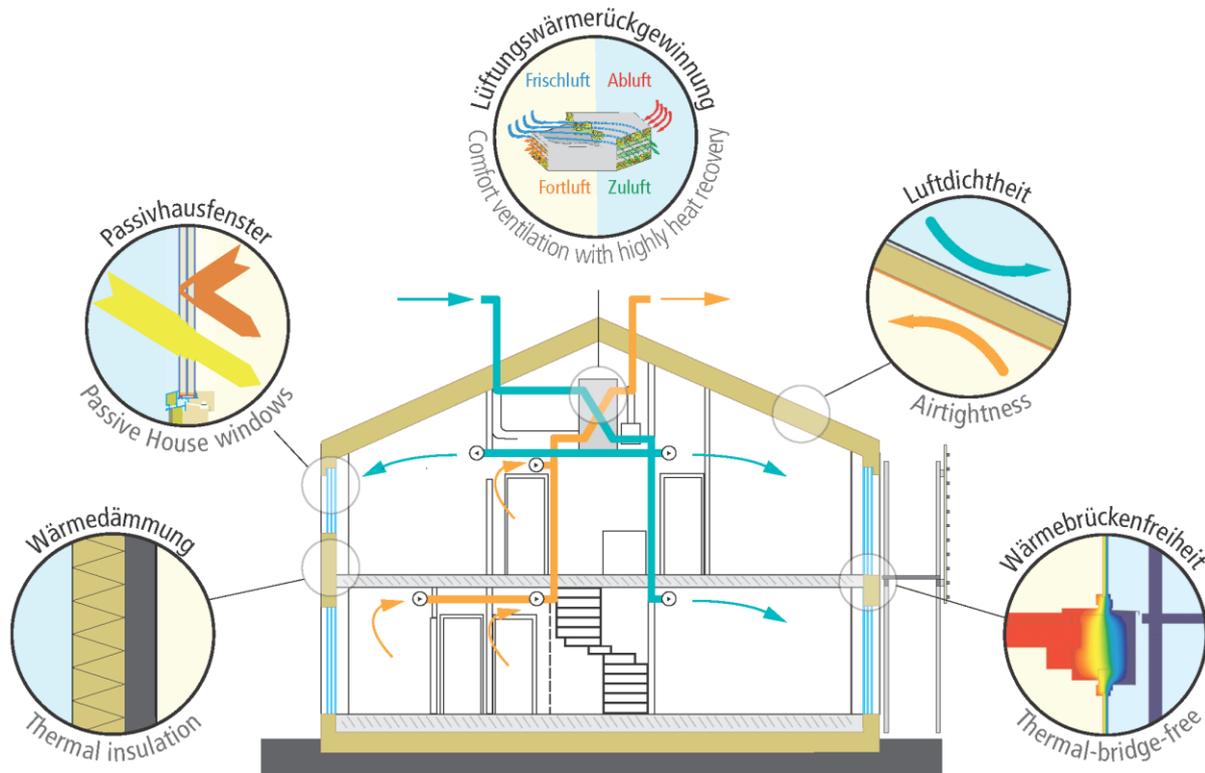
Typical passive house solutions, source: (Passive House Institute, 2016)
